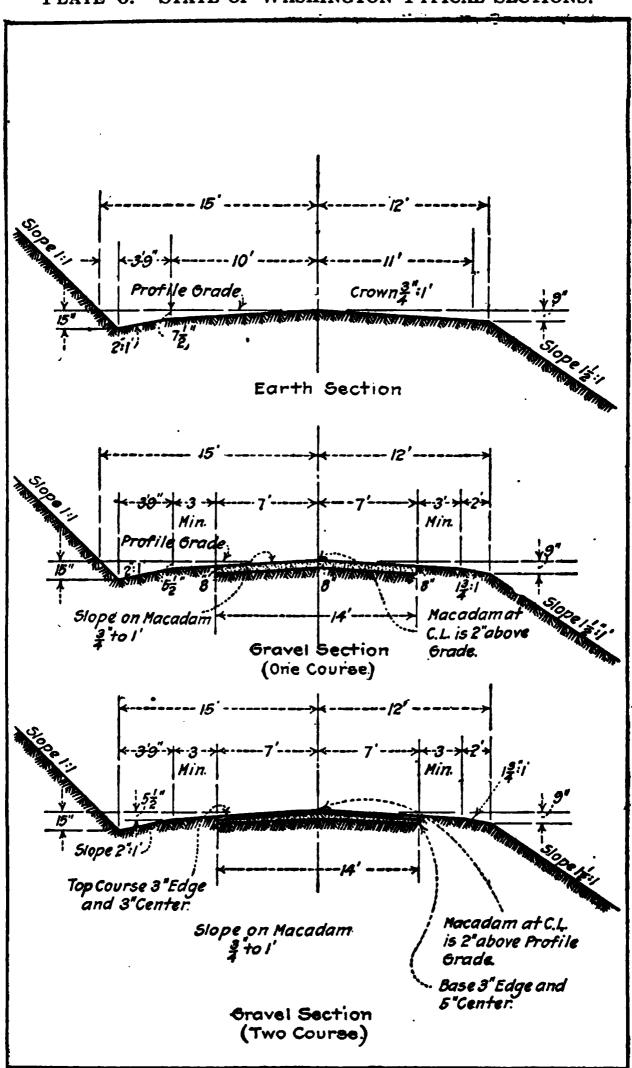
STATE OF WASHINGTON TYPICAL SECTIONS.
